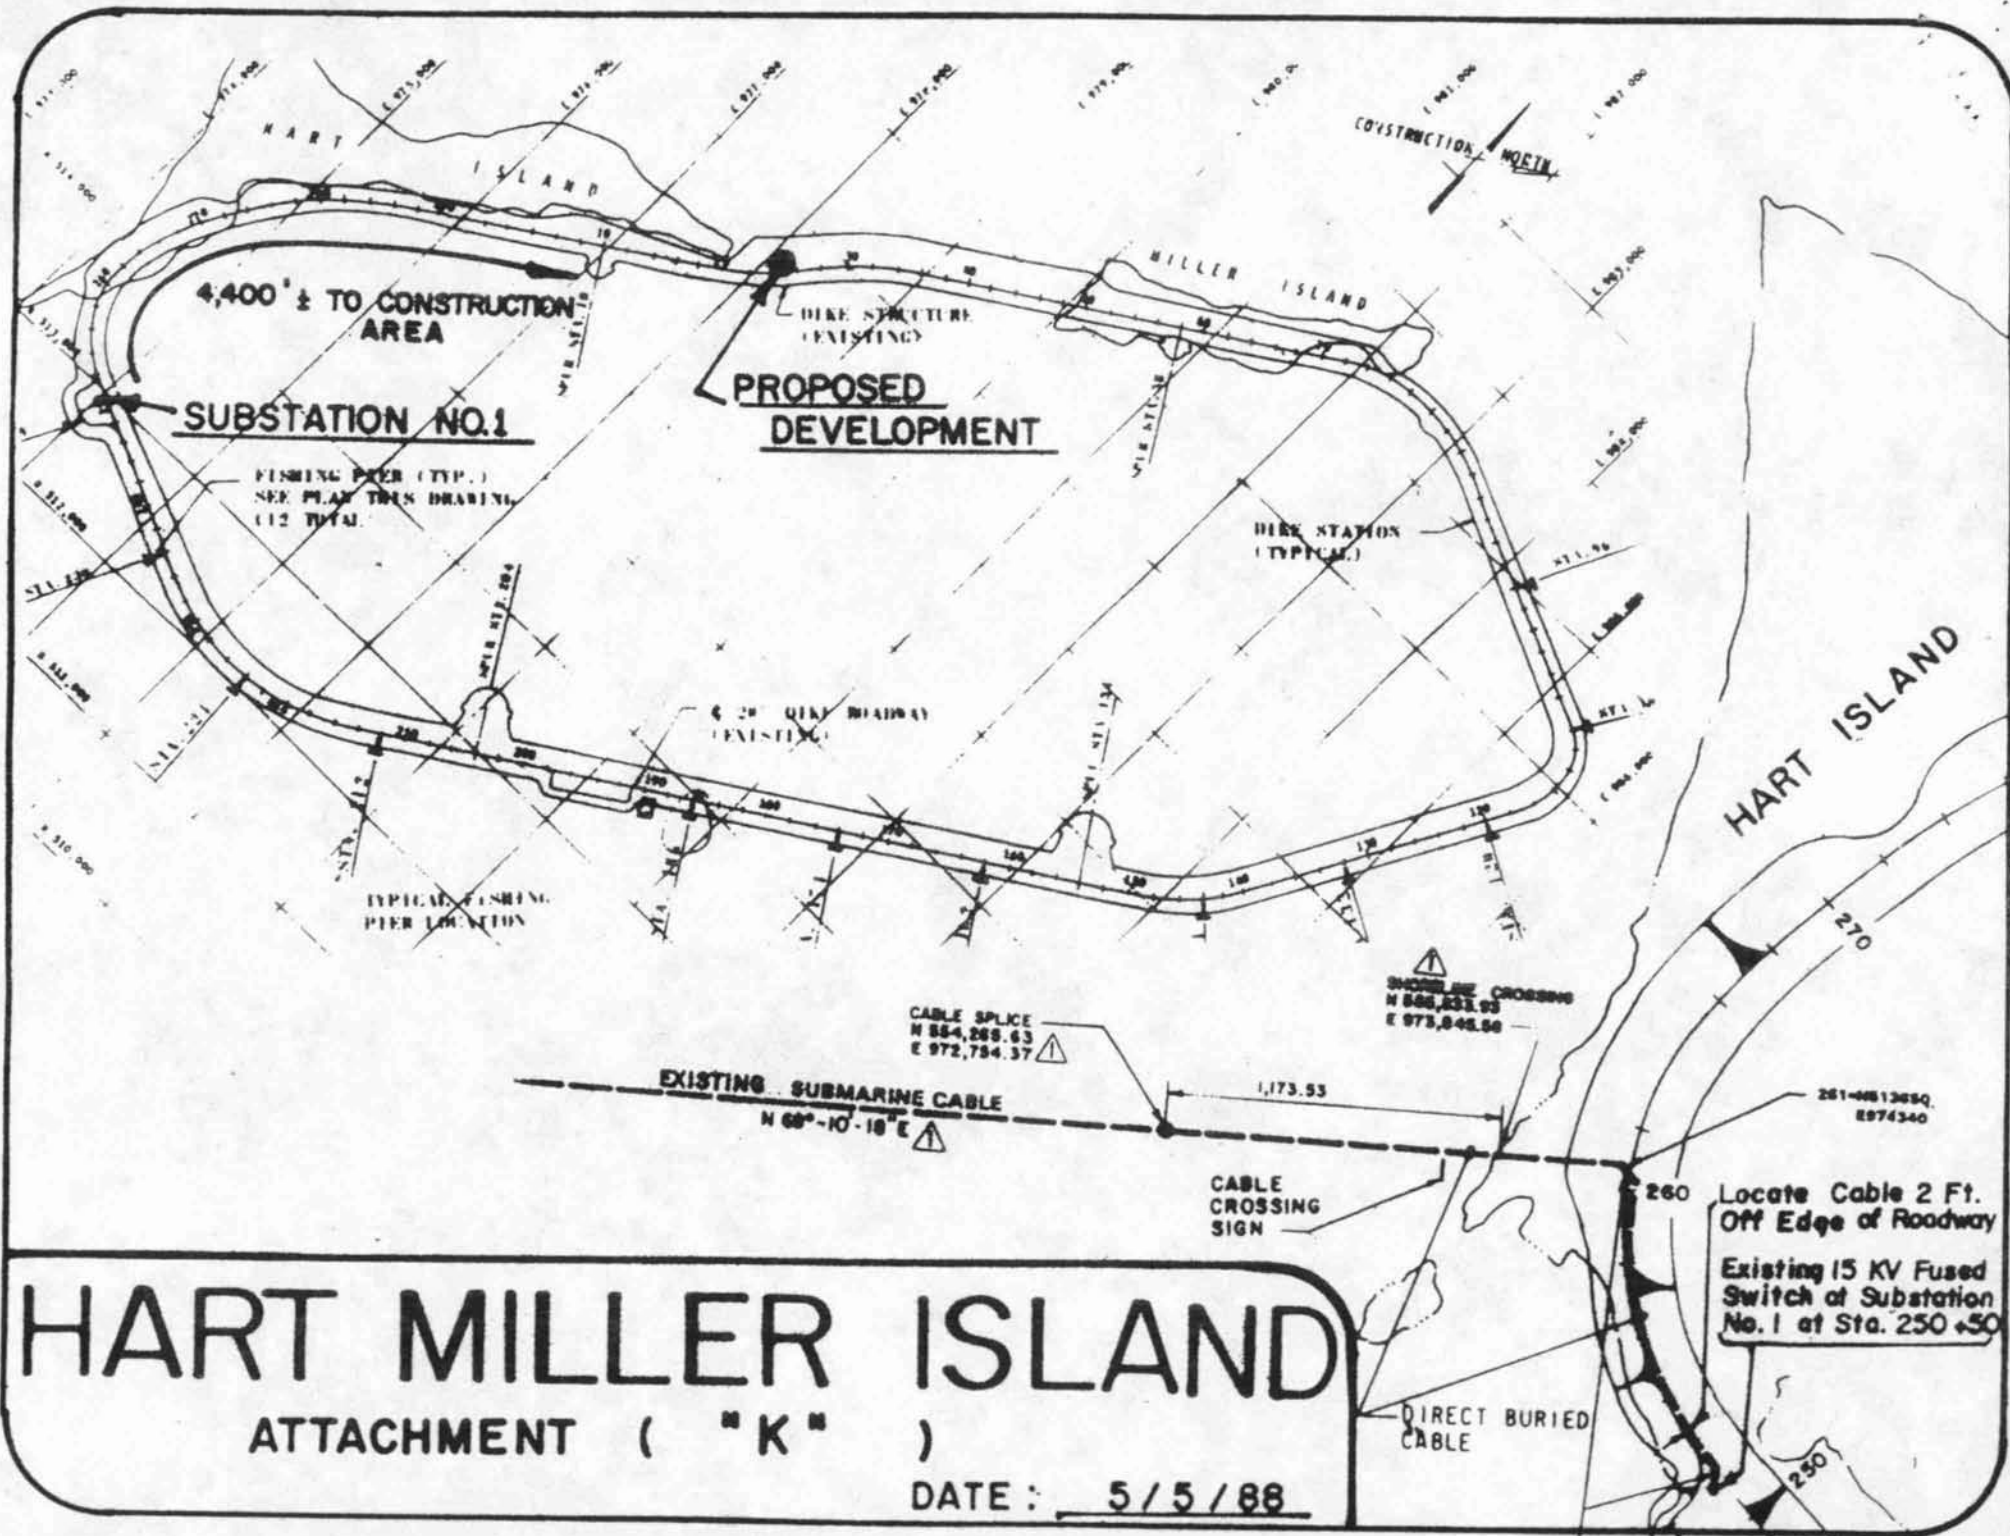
DESIGN WORKSHEET - PLAN VIEW
